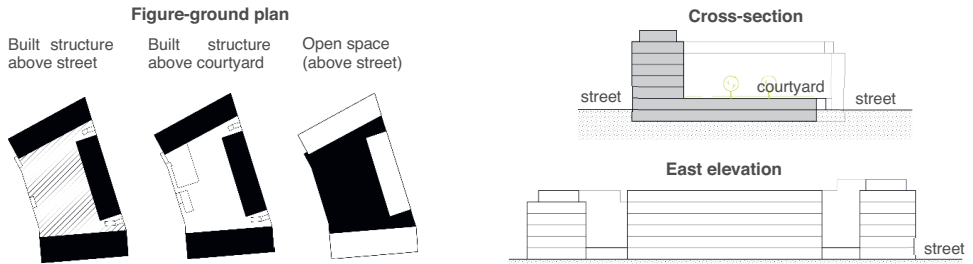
Example of podium type – plan drawings (within zoning plan limits), sections showing built and outdoor spaces relative to the surrounding streets, and east elevation; case located in Lille Bislett 2–26
